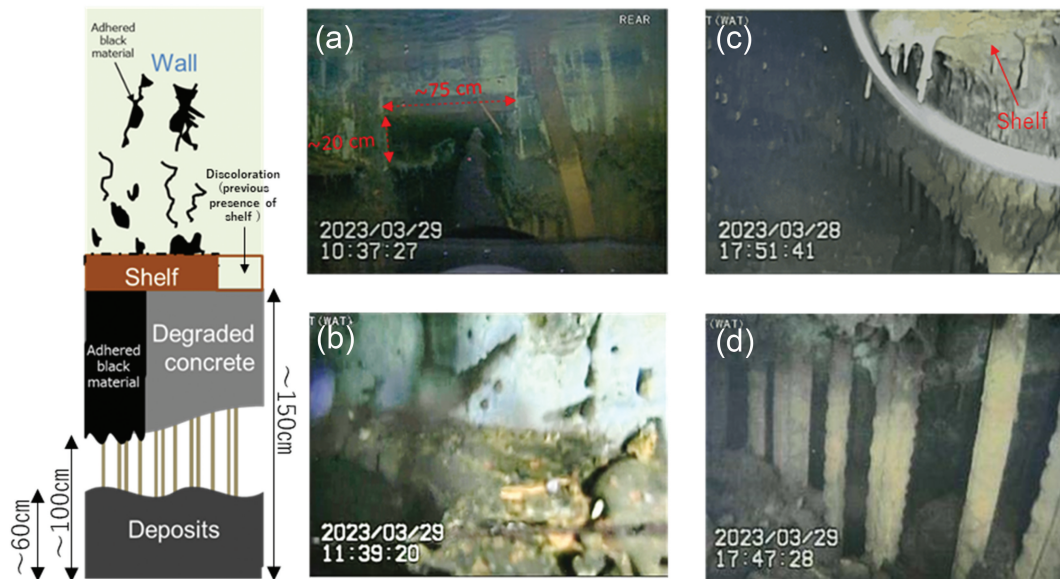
Left: vertical distribution of wall states. (a) State difference above and below shelf level around the pedestal opening (E-3). (b) Dark materials attached to the wall and accumulated on the shelf (NNE-3). (c) Concrete degradation below the shelf level (E-3 to ENE-3). (d) Exposed rebar and lower deposits bed (NE-3).
